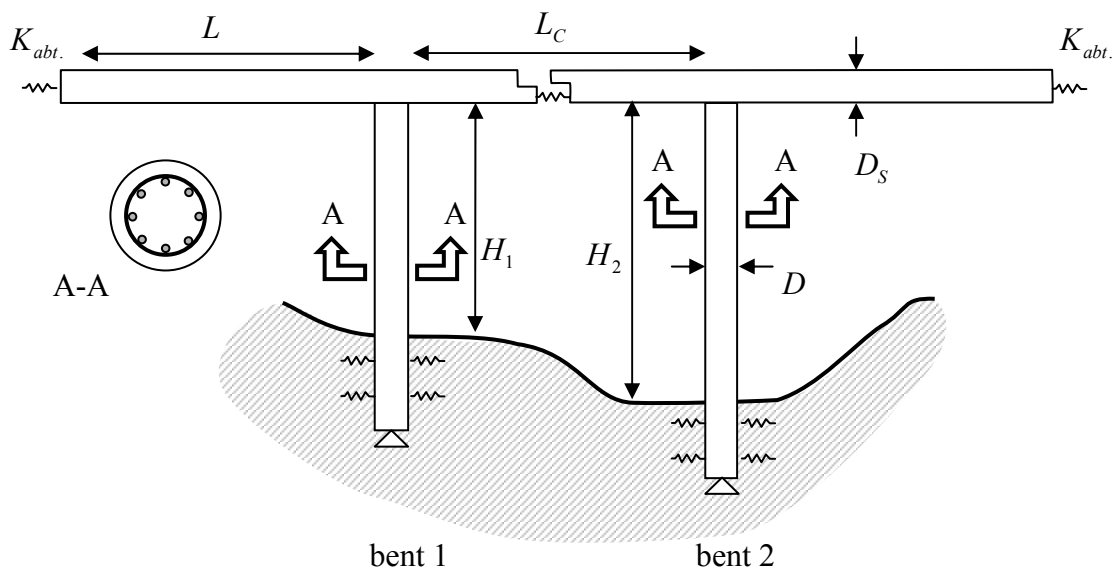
Design parameters for the example two-bent overpass bridge (not to scale).
